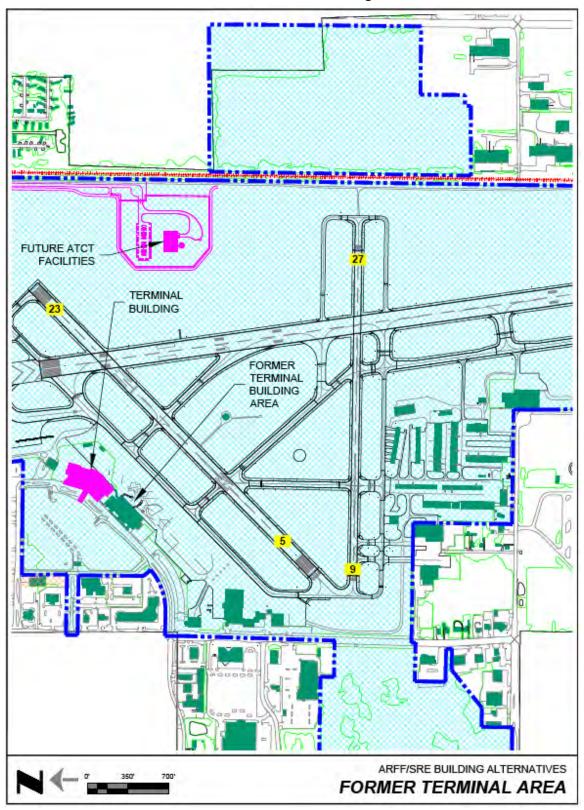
Alternative 10 – Consolidated ARFF/SRE Building at Former Terminal Site
